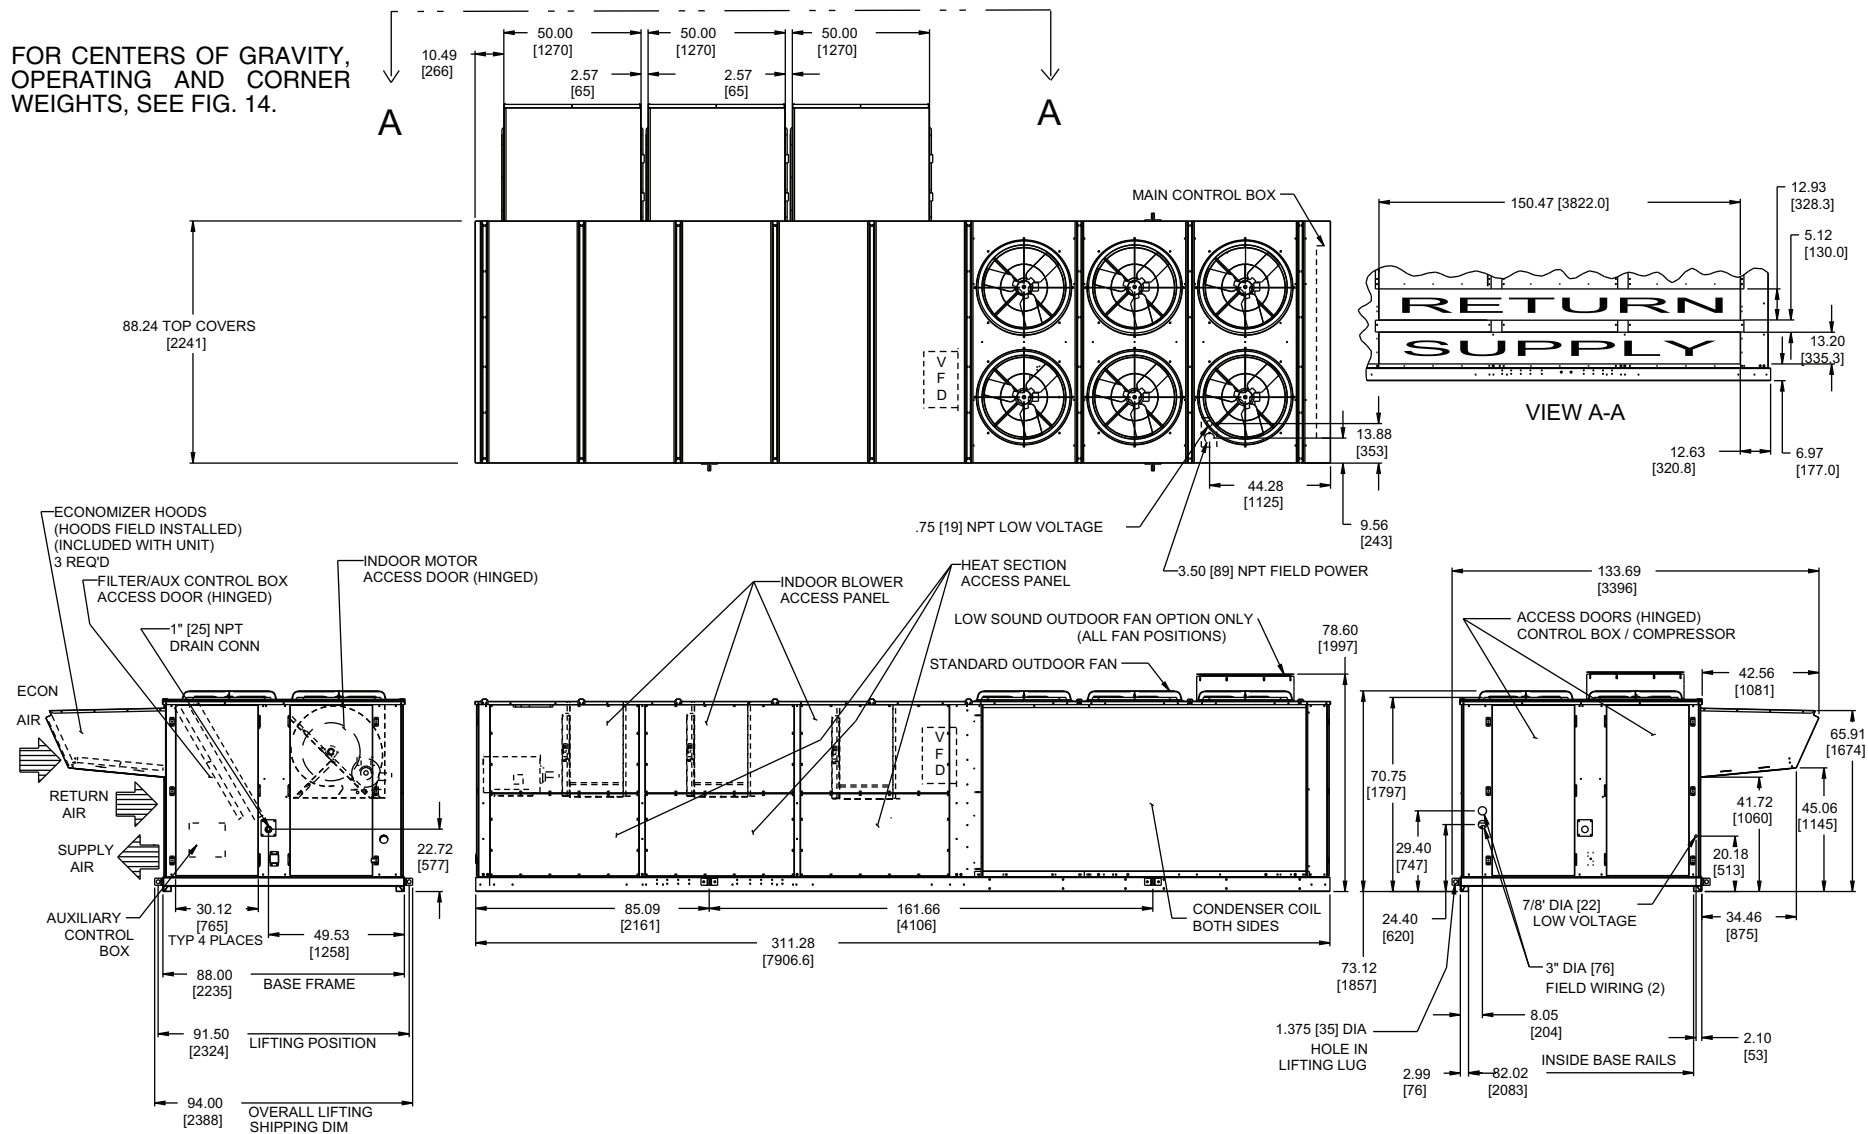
Base Unit Dimensions RTPF, Cu Tube Condenser Side Supply and Return — 48A4,A5,A8,A9060
